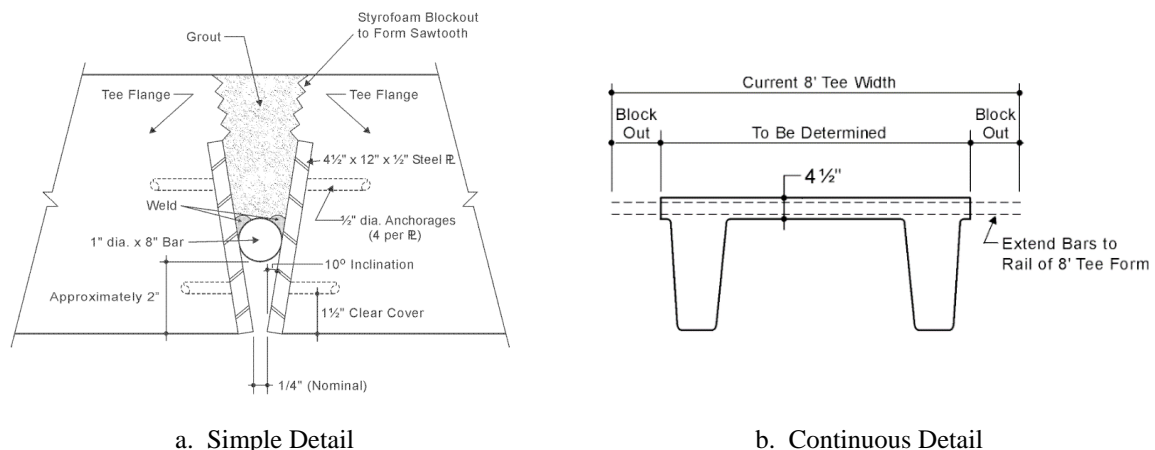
Recommended Longitudinal Joint Detailing (Jones, 2001)
